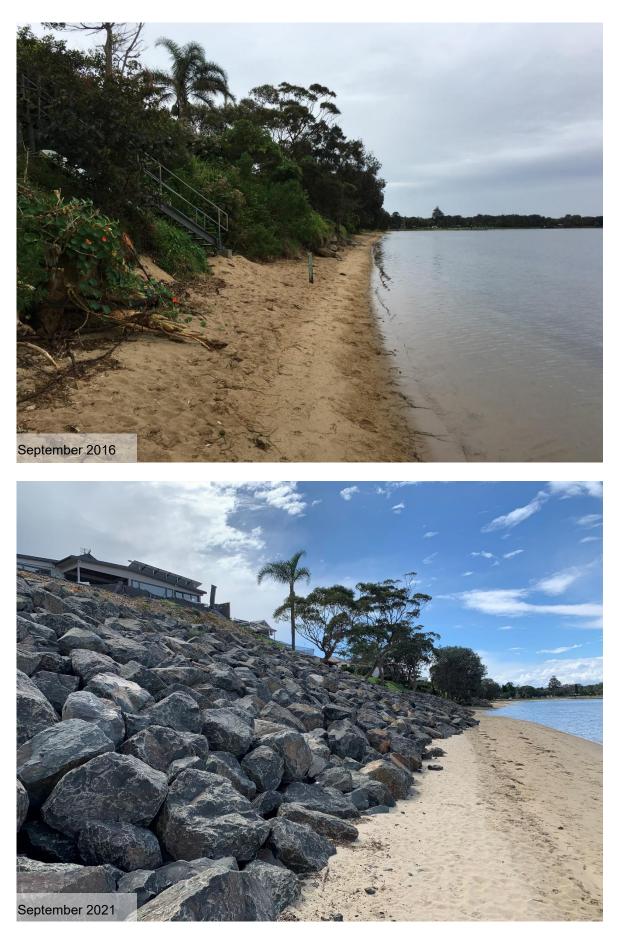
Eastern section of rock revetment, at Ch 600 m looking east
